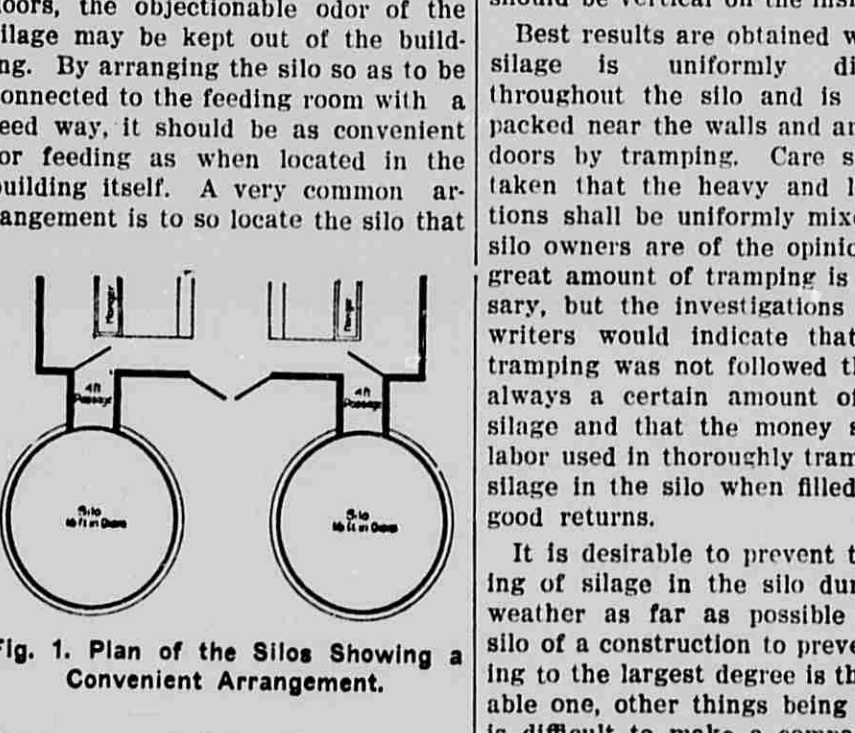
Plan of the Silos Showing a Convenient Arrangement.
